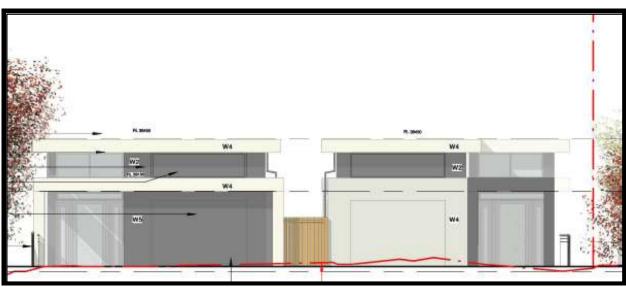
Proposed Front Elevation – 87 Woronora Parade, Oatley
